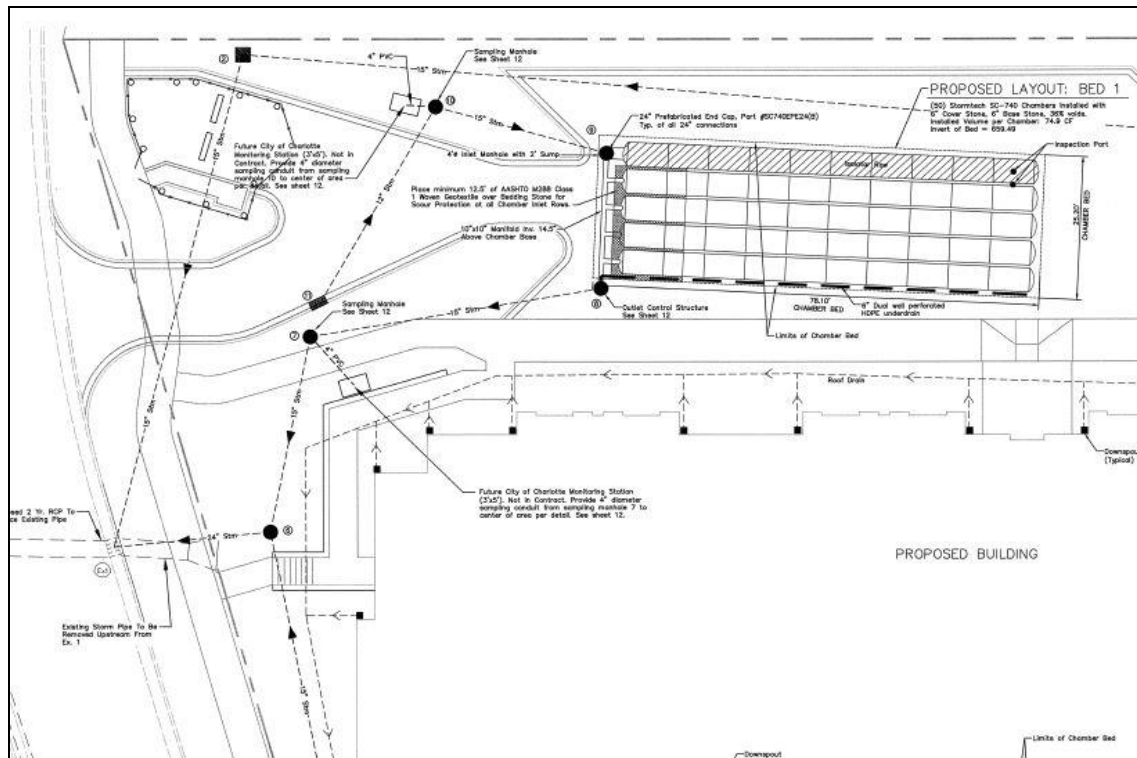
Cherry Gardens Storm Tech Plan View Layout
